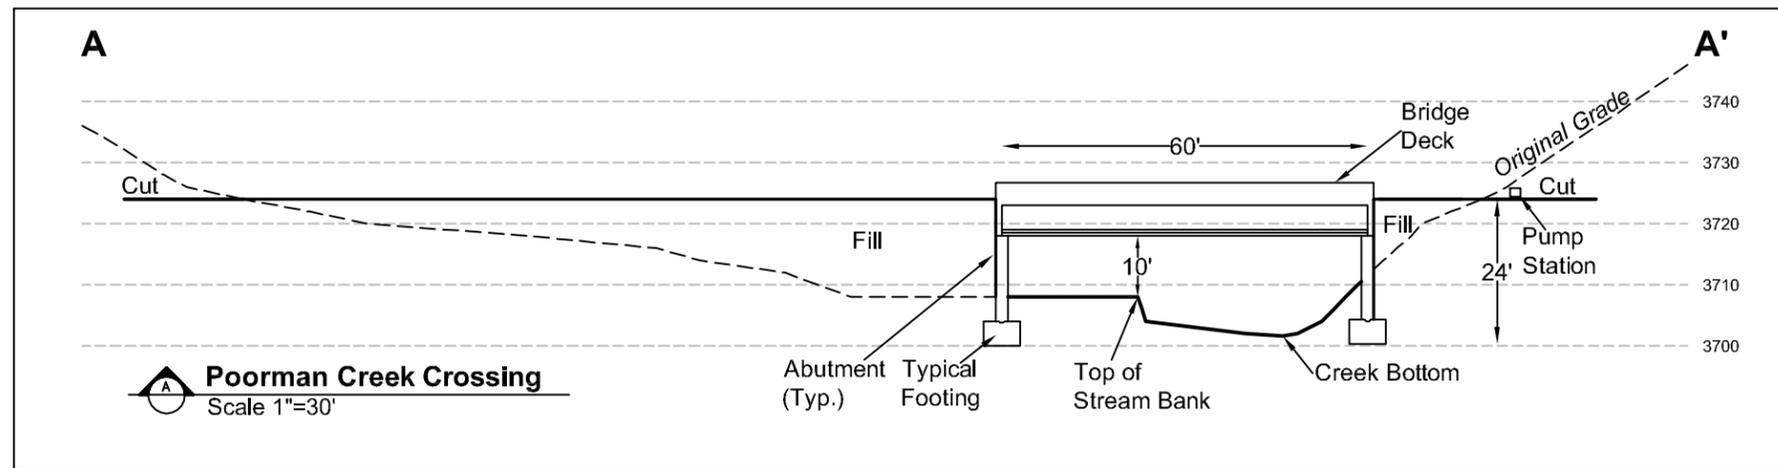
Details of Tailings Pipelines, Utility, and Access Road Corridor, Alternative 2
